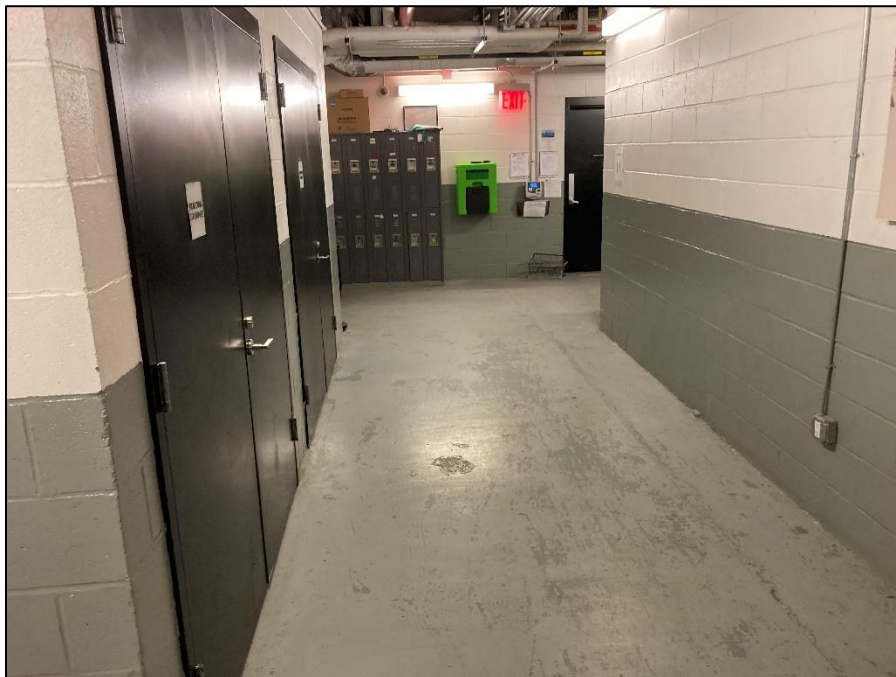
, 02/16/2022: View of SMD riser behind maintenance hallway wall panel.
